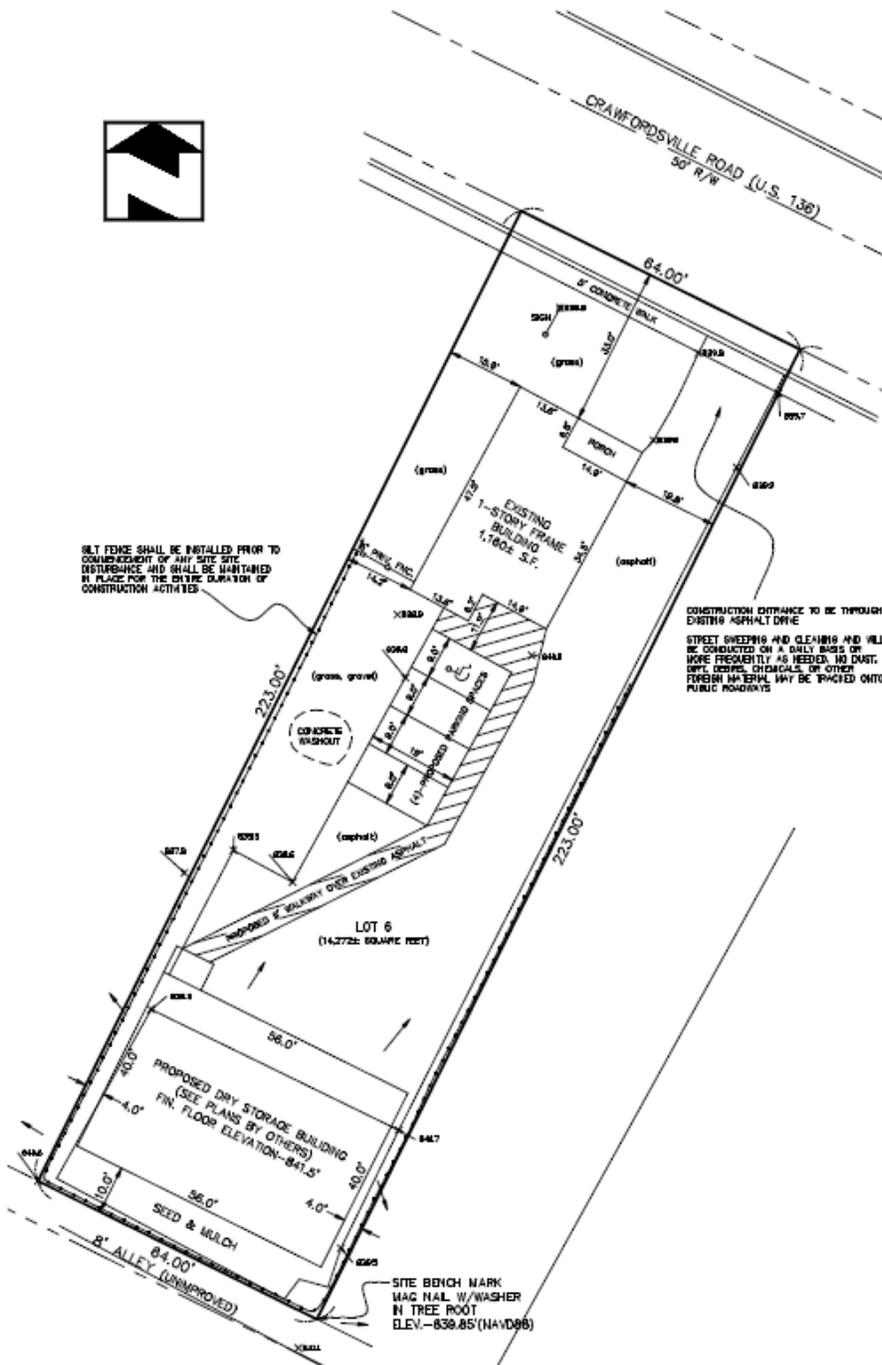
Site Plan for 9111 Crawfordsville, if variance of use is approved.
